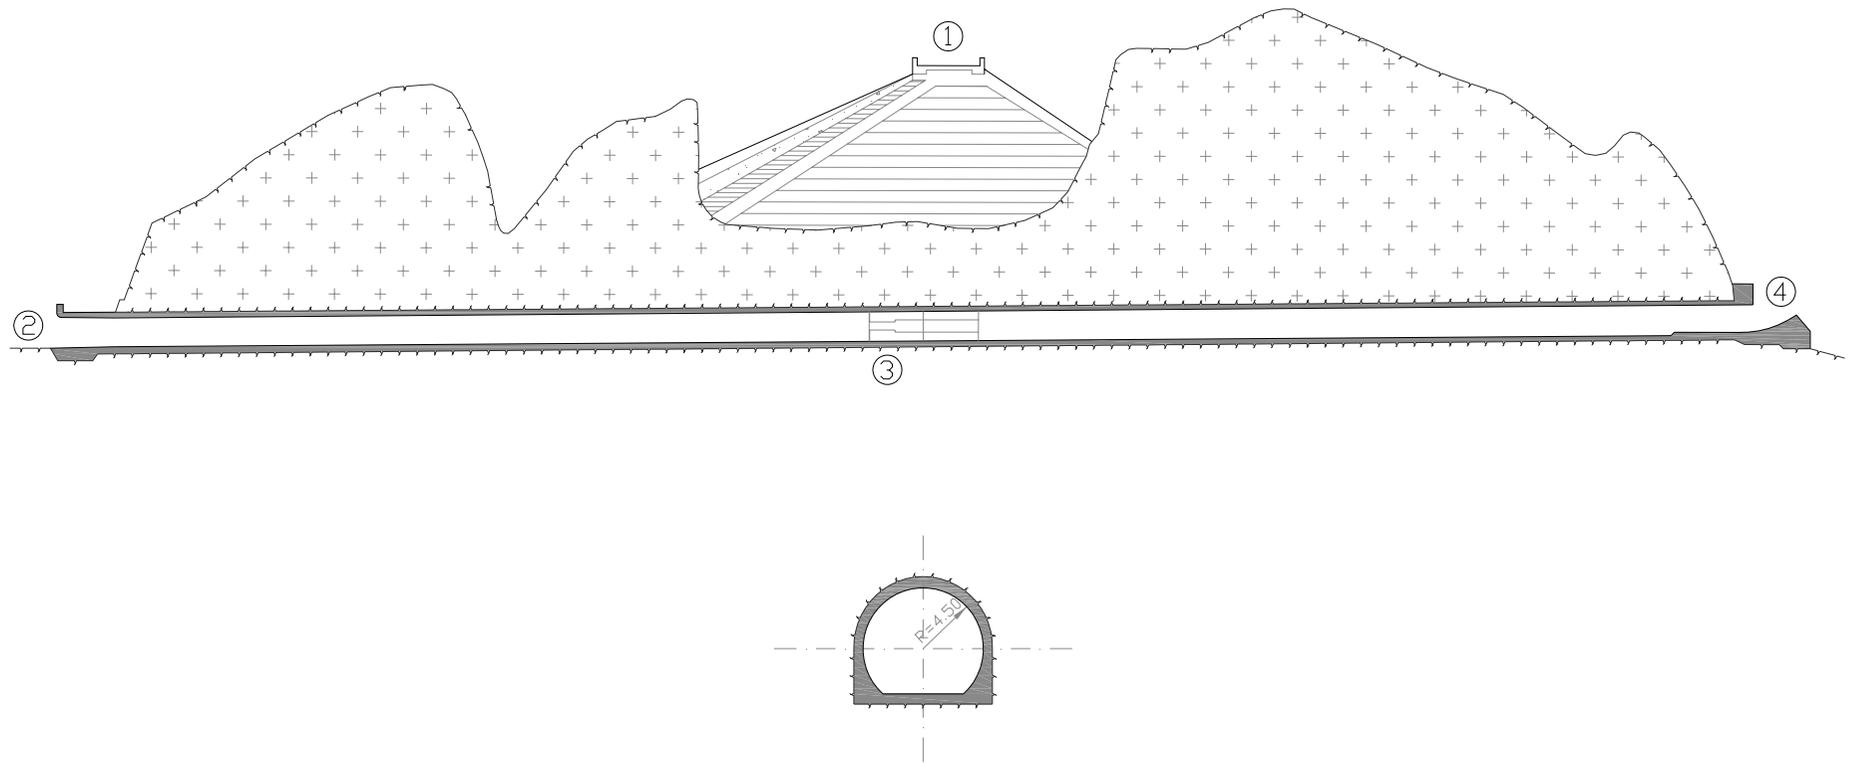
Longitudinal profile of diversion tunnel No. 2. ①: dam, ②: intake, ③: concrete plug, ④: flip bucket.
